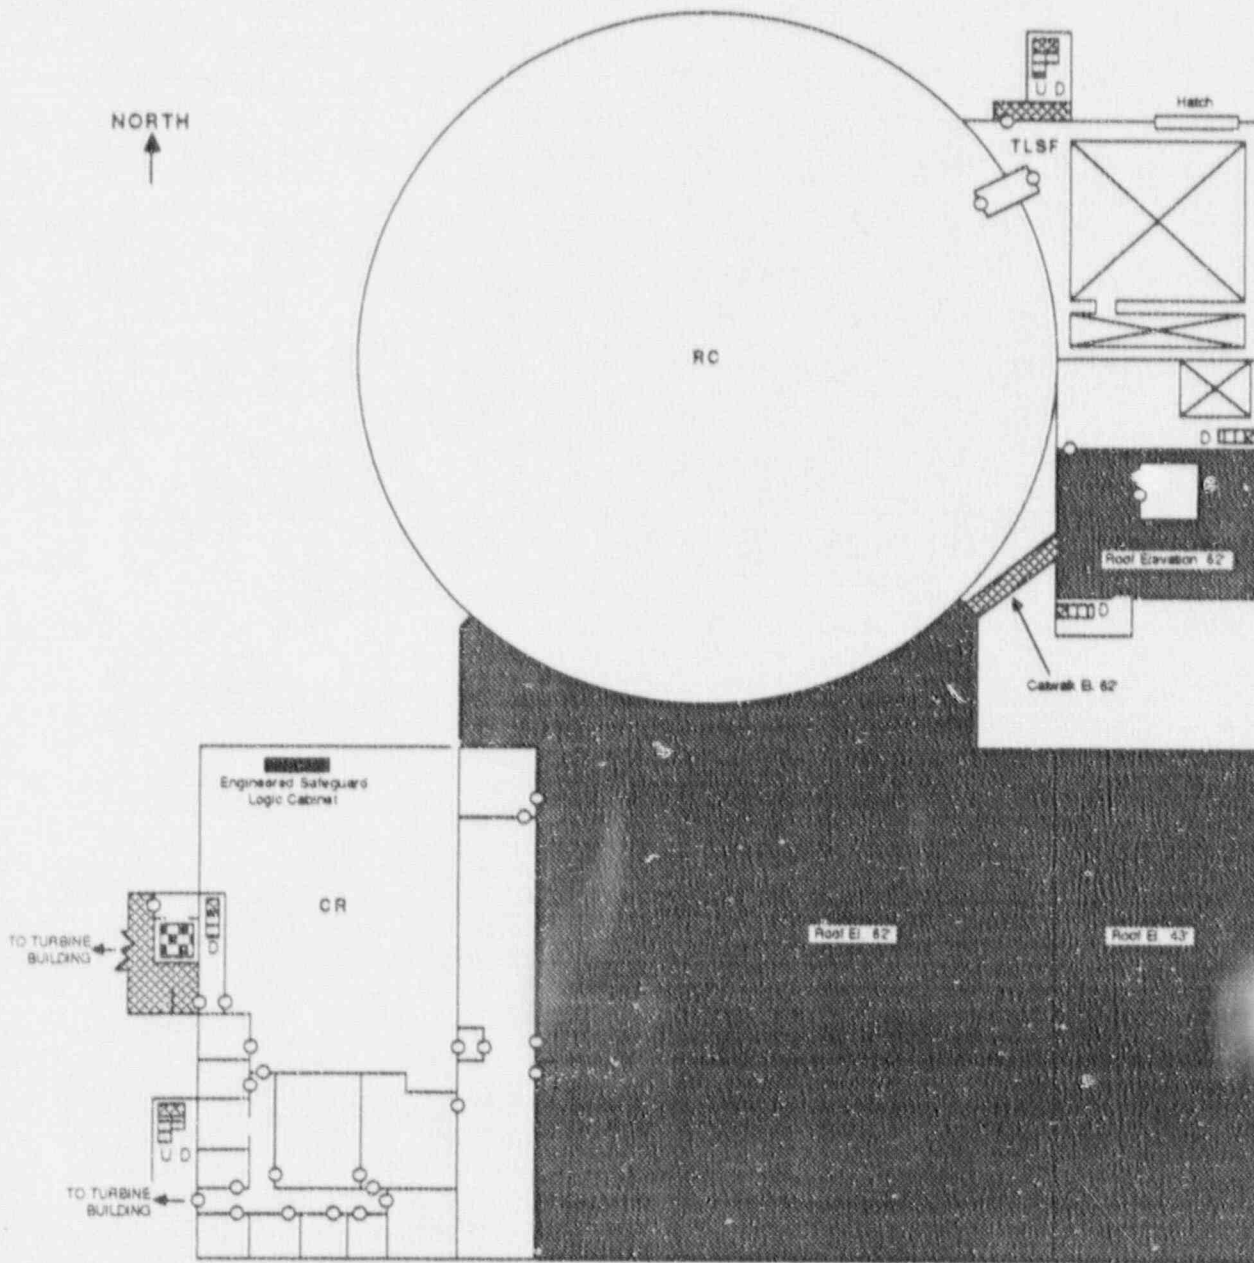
St. Lucie 1 Reactor Building, Auxiliary Building, and Fuel Handling Building, Elevation 62'
